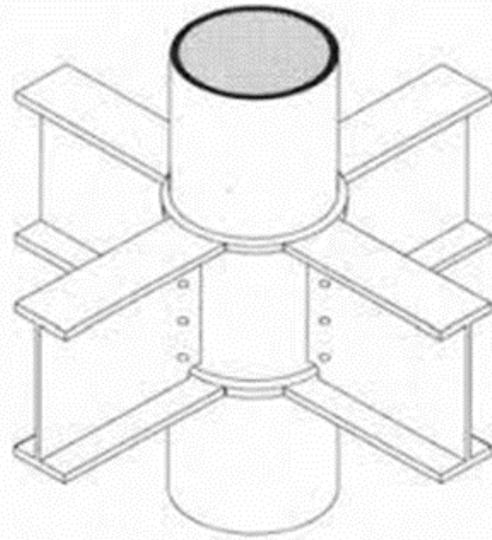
Prefabricated connection for girder and concrete-filled steel tube column
